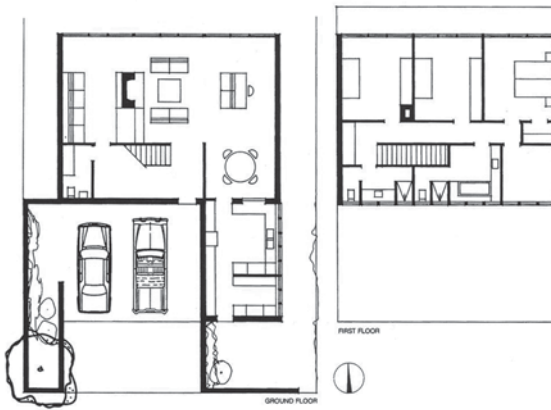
Indicative plan of the Bardas House by Guilford Bell, 1958.
